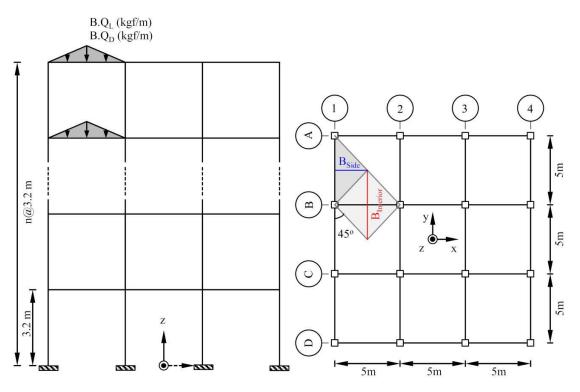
Plan of the studied structures and the distribution of vertical loads on beam elements
